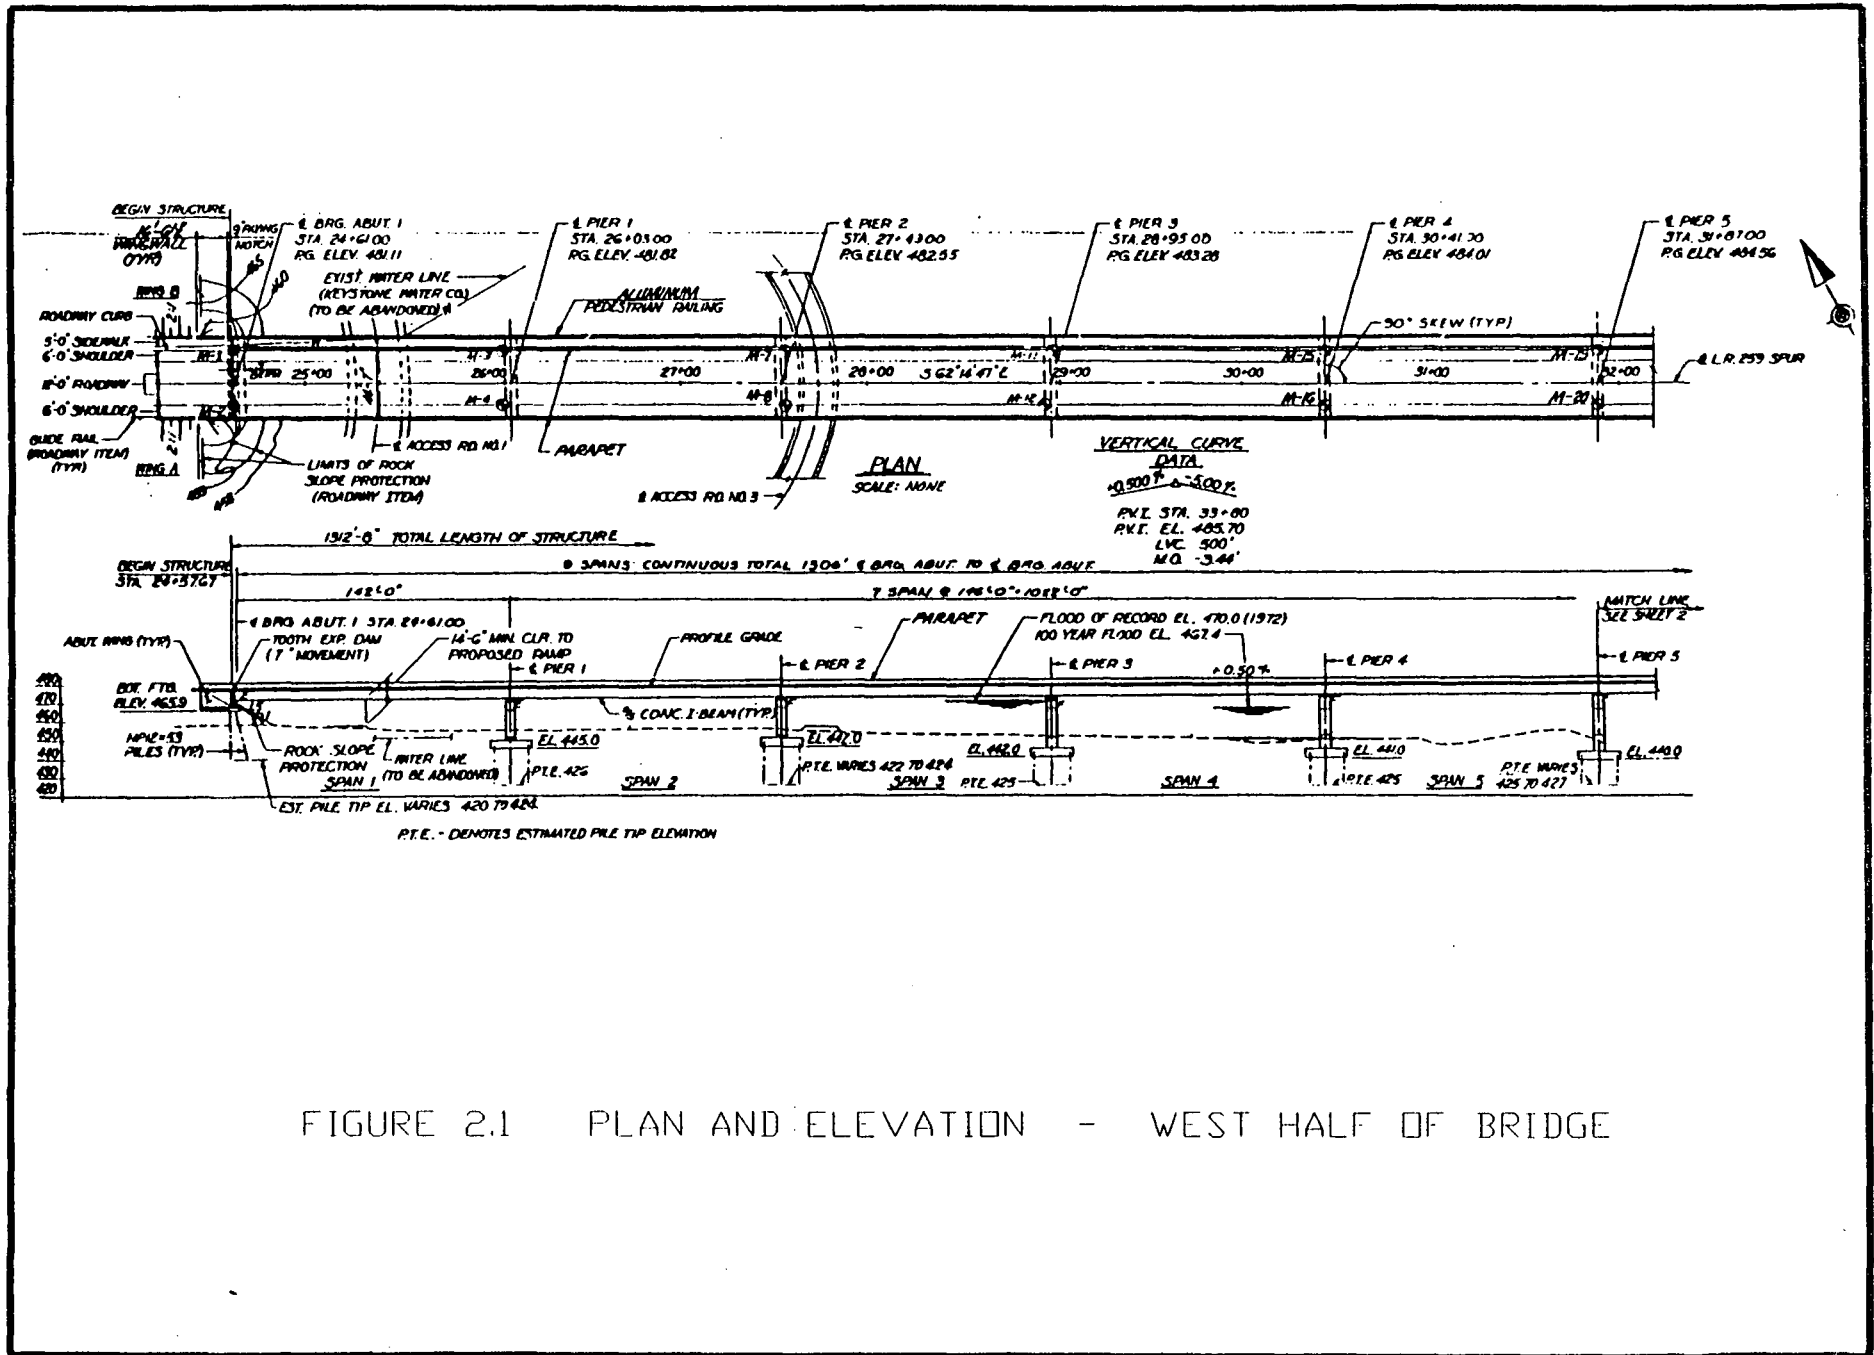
PLAN AND ELEVATION - WEST HALF OF BRIDGE
